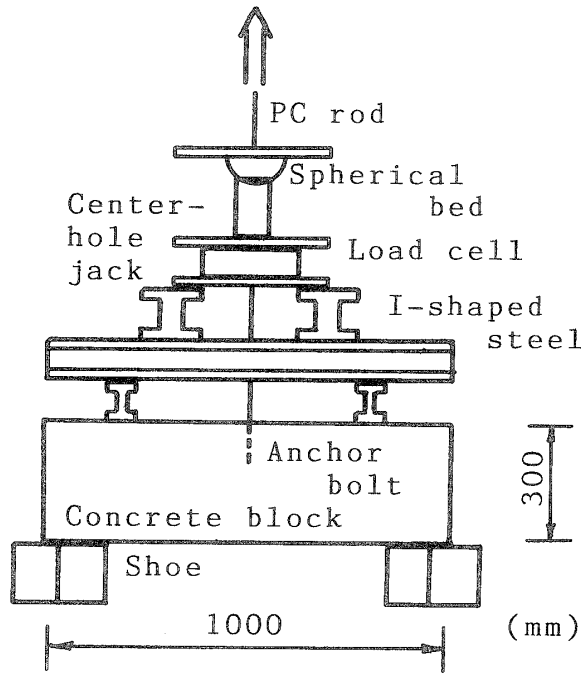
Pull-out test of anchor bolt from the concrete block.
